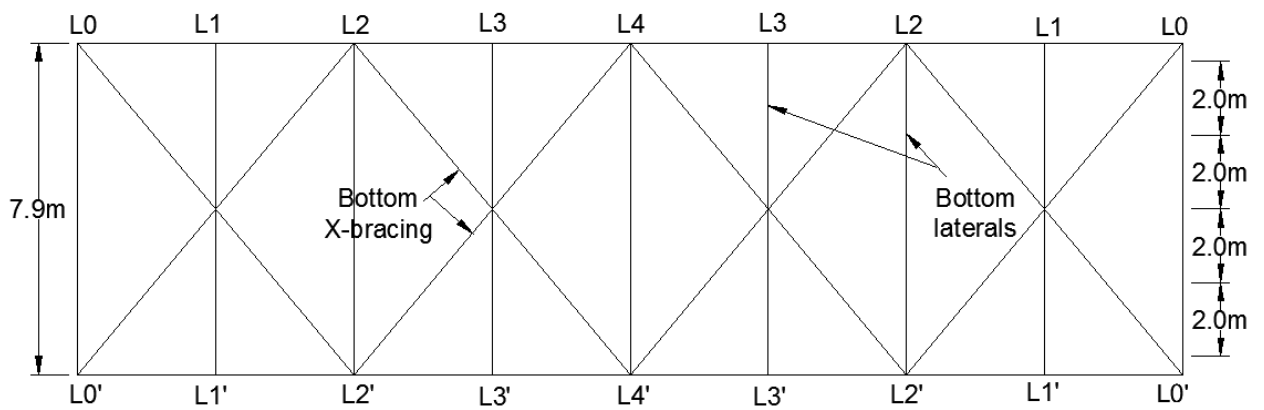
shows the 30.0m span K-type deck truss bridge. Centre to centre distance between two trusses is 7.9m and height of truss is 8.5m. Cross girders are spaced at 3.75m and two stringers are spaced at 2.5m c/c. In the through type truss bridge, deck is supported only on cross girders and stringers due to obstruction of vertical and diagonal members. Therefore, five stringers are used to avoid cantilever projection of deck slab. In case of deck type truss bridge there is no such obstruction and it is possible to construct deck over top chord members, stringers and cross girders. As in deck type truss bridge top chord members also carry direct load from deck, only two stringer beams are required.
